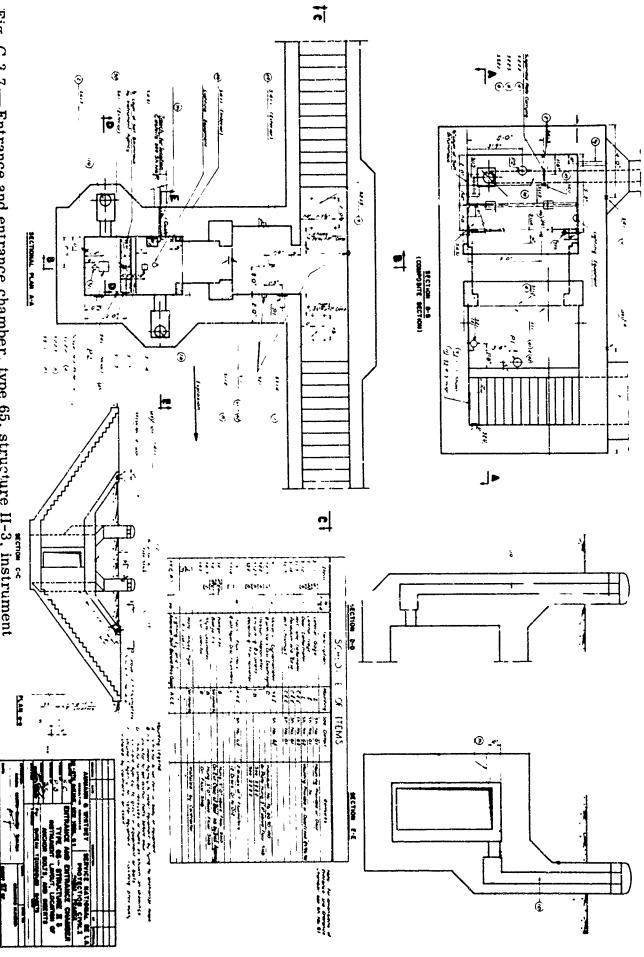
Entrance and entrance chamber, type 65, structure II-3, instrument layout, location of anchor bolts, and inserts.
